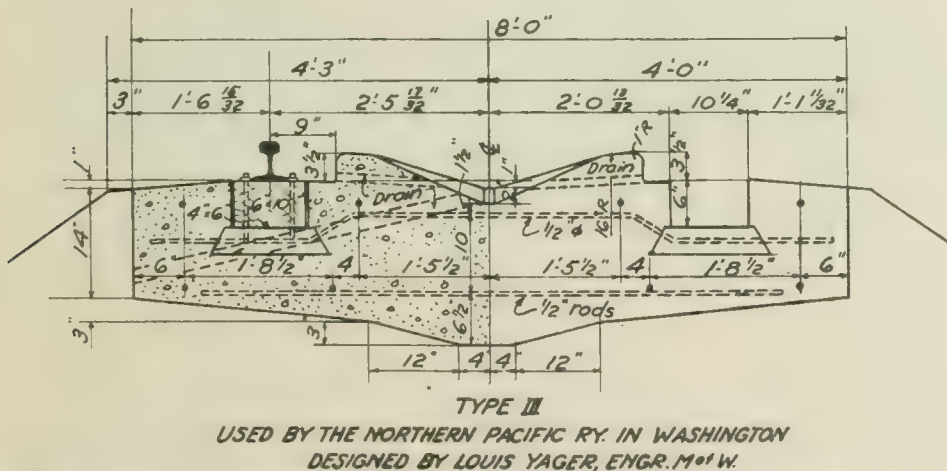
TYPE 3 USED BY THE NORTHERN PACIFIC RAILWAY IN WASHINGTON.
